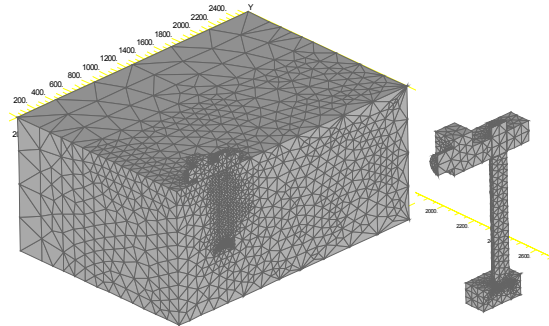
Finite element discretization – concrete block and anchor bolt (symmetry - 1/2 of the geometry).
